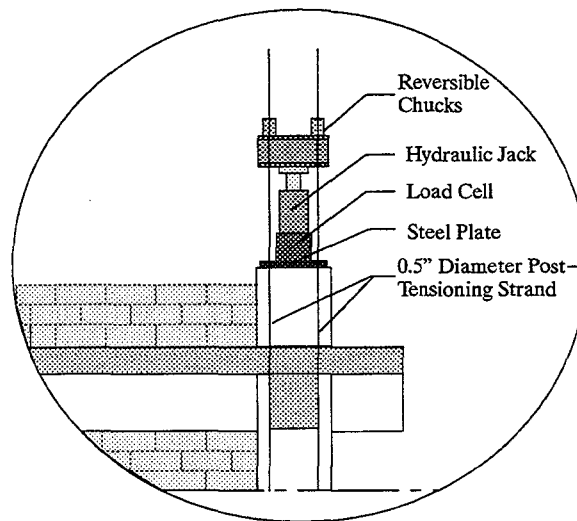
Elevation of Vertical Loading System (Top-Beam Column Joint)
